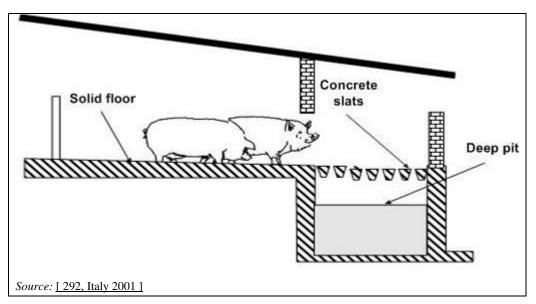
Solid concrete floor and fully slatted external alley with a storage pit underneath
